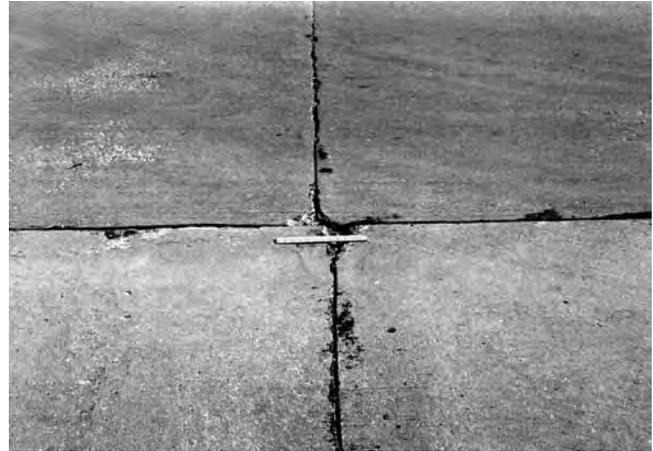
Low-Severity Spalling, Corner
